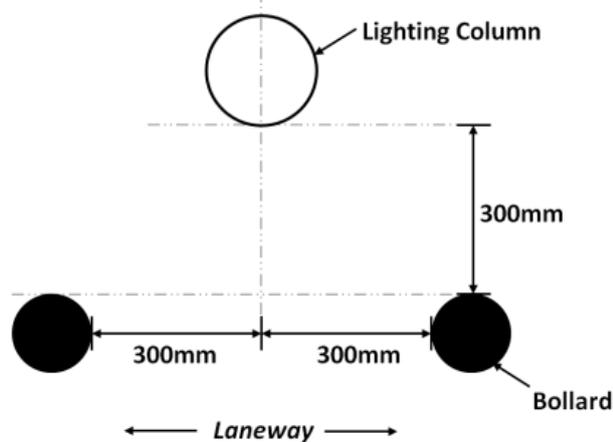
Typical Public Lighting Bollard Heavy Duty - (Not to Scale)
